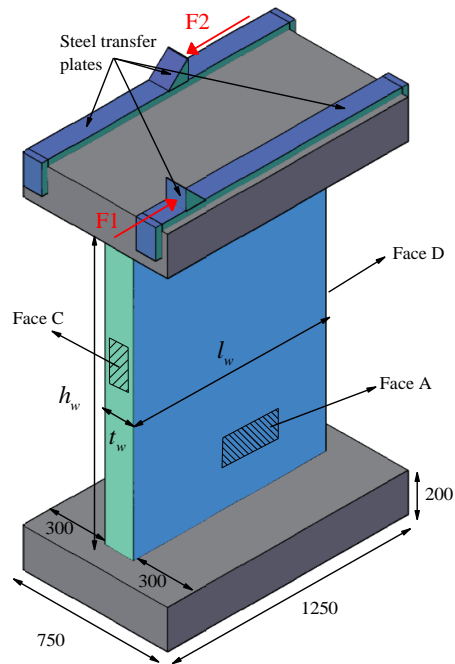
General arrangement of the wall specimens tested by Peng and Wong (2011) (dimensions in mm)..
